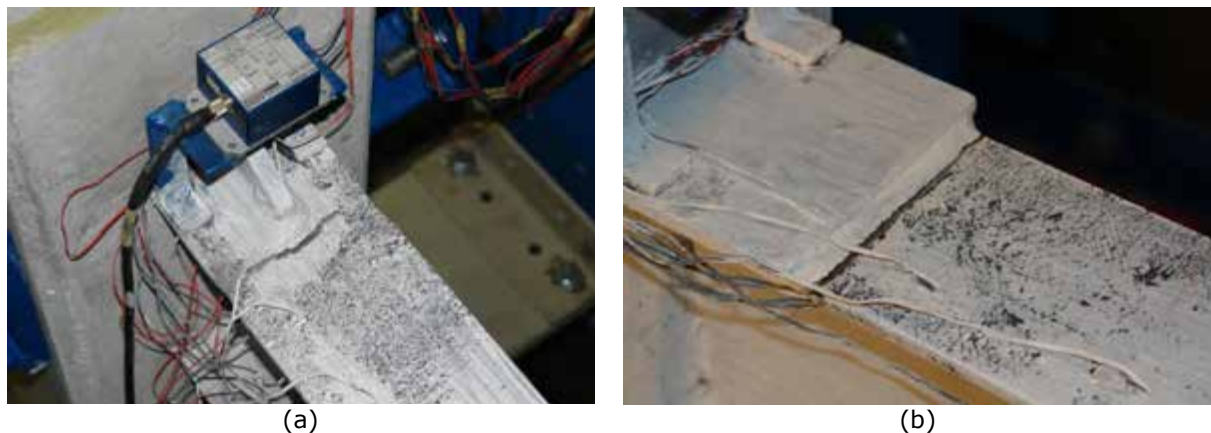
Fracture in the upper beam flange: (a) specimen RS1.3, (b) specimen CP2.3
